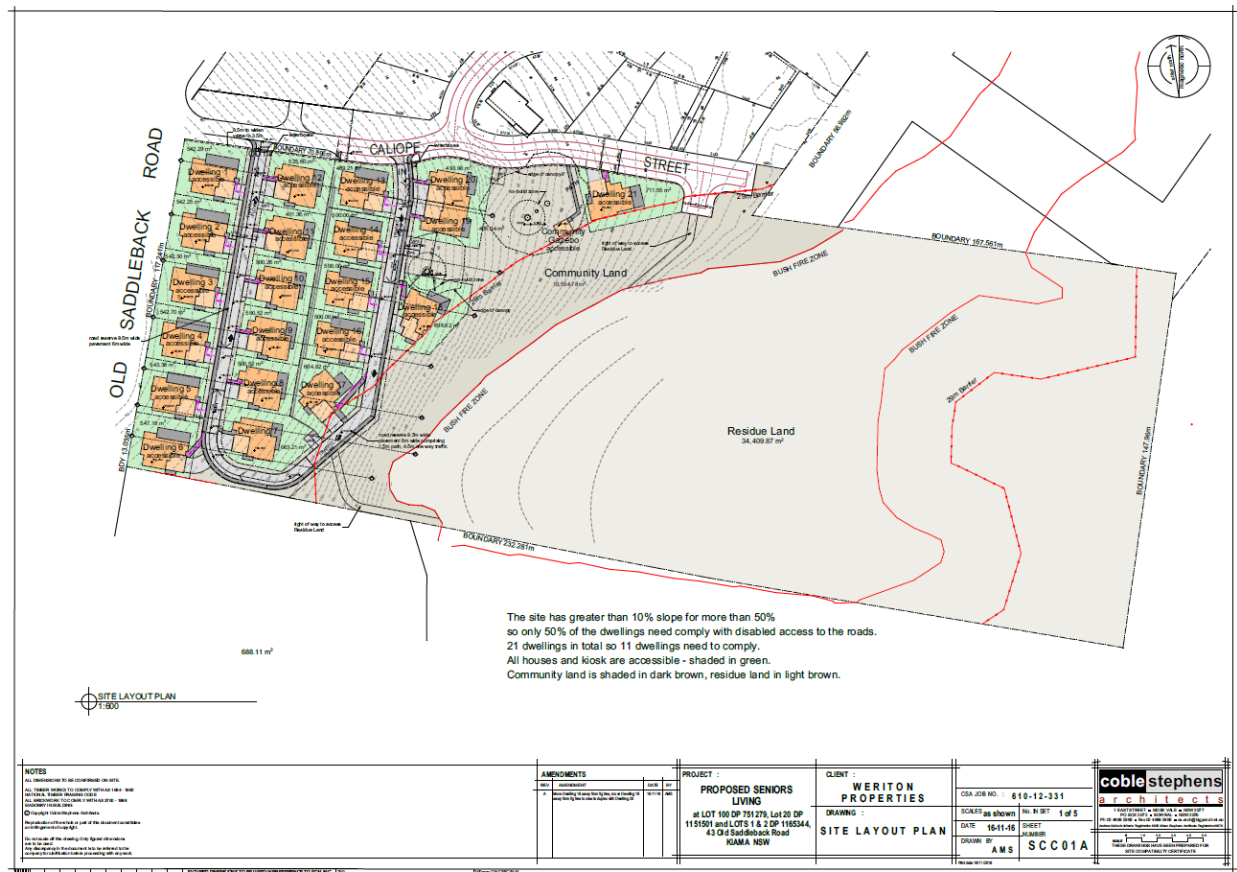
Previous SCC_2016_KIAMA_001_00 approved site plan
